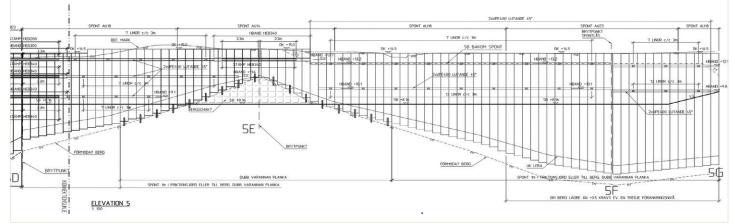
Elevation showing part of the sheet piles for building 17 in an area where depth to rock was as low as 3.5 meters (use of rock bolts).
